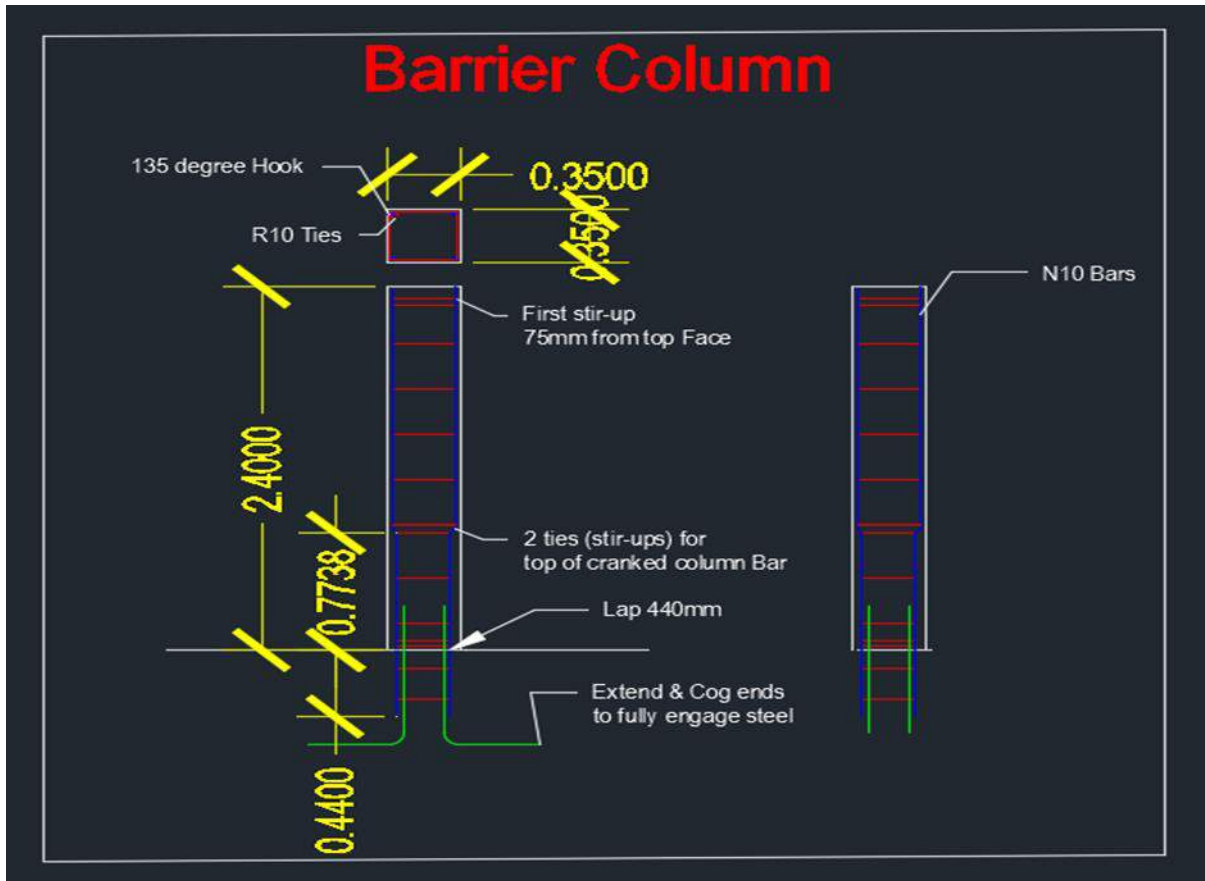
Engineering Drawing of Column Reinforcement (DPC Urban Planning 2017)
